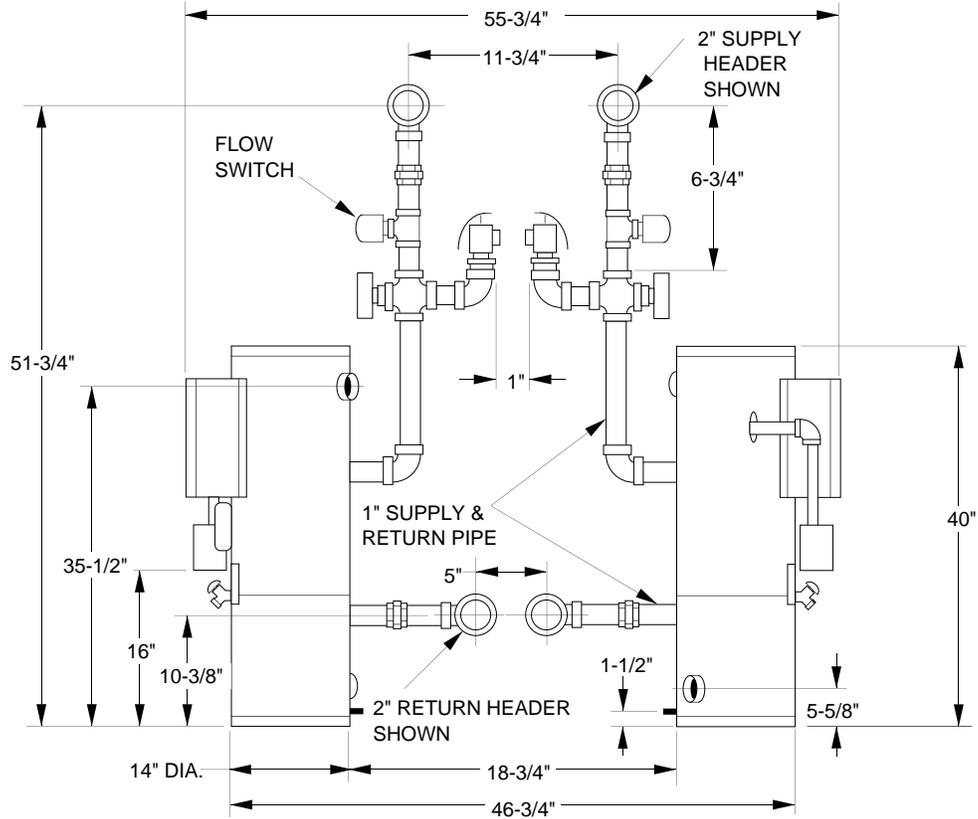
MODEL AM-100 BACK-TO-BACK ARRANGEMENT FOR TIGHT SPACE
